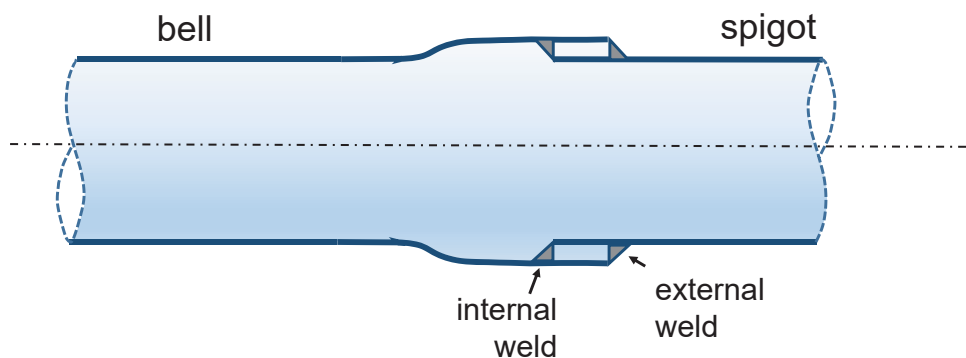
Schematic configuration of the lap welded steel pipe joint.
